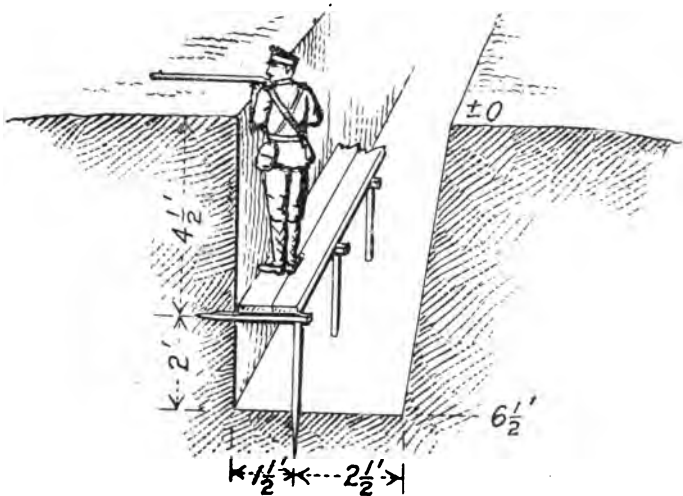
FIRING TRENCH WITHOUT PARAPET
